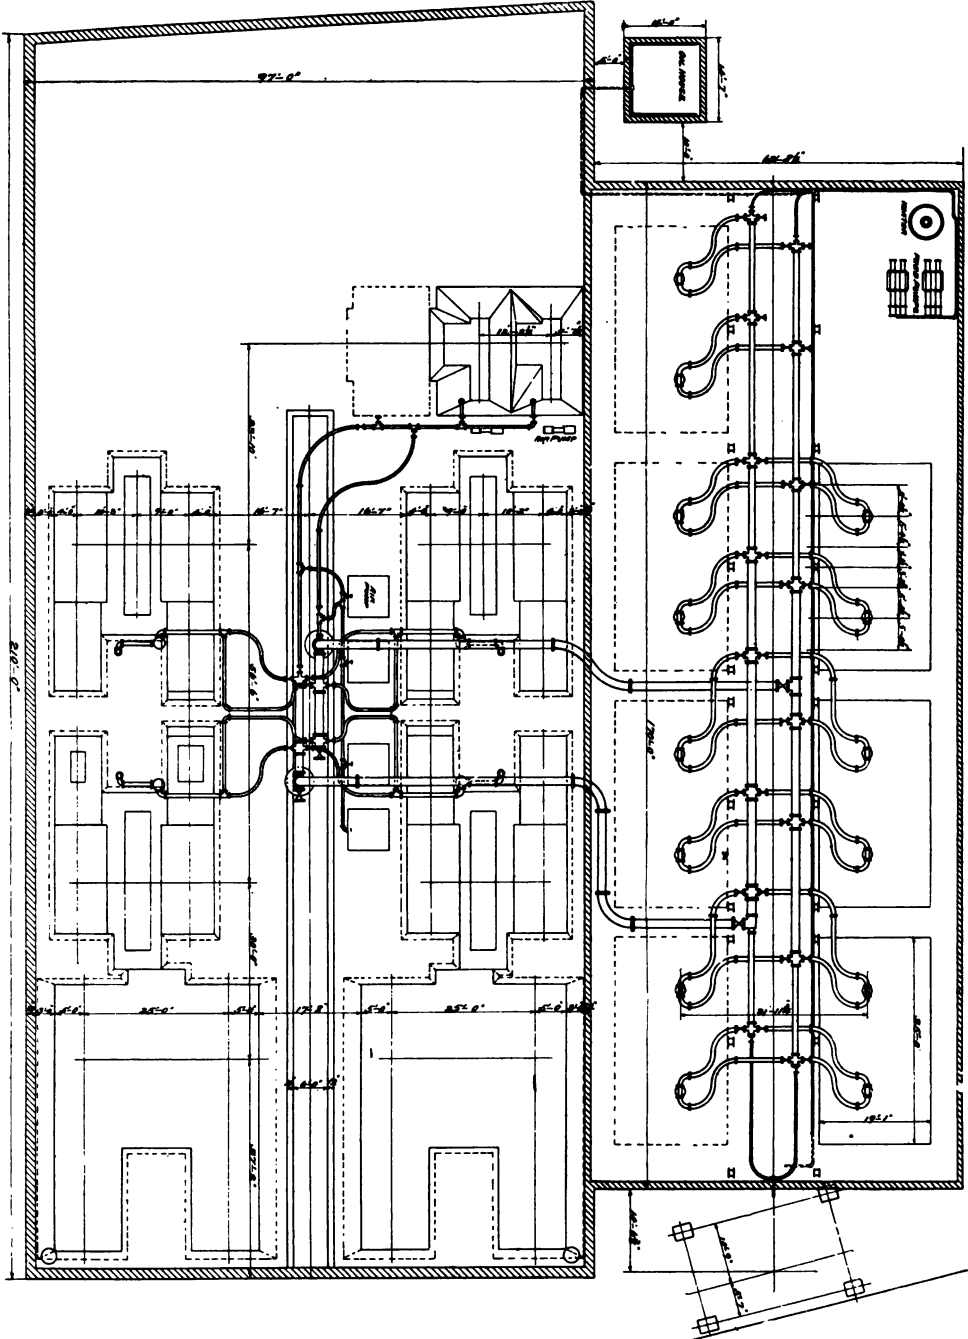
General Plan, Showing First Installation, Gold Street Station.
